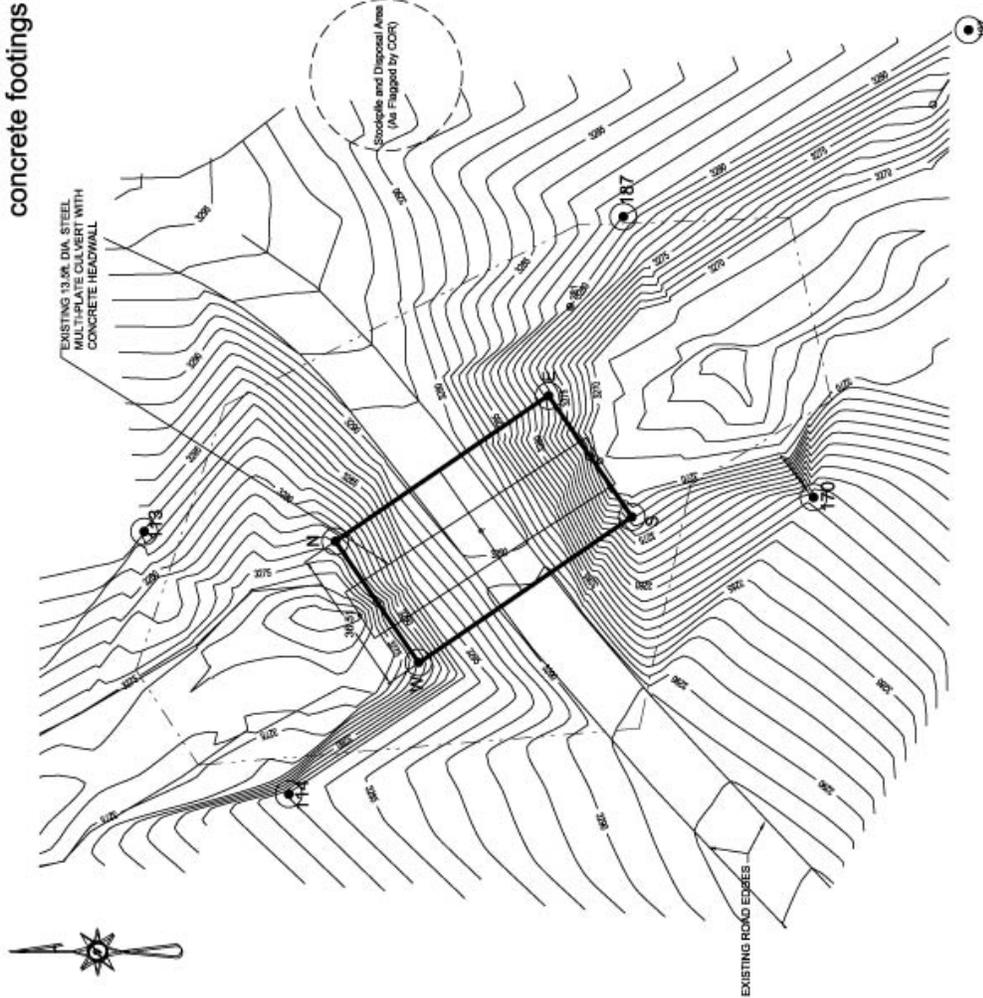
Humbug West Sheet 12 - Foundation Details.
